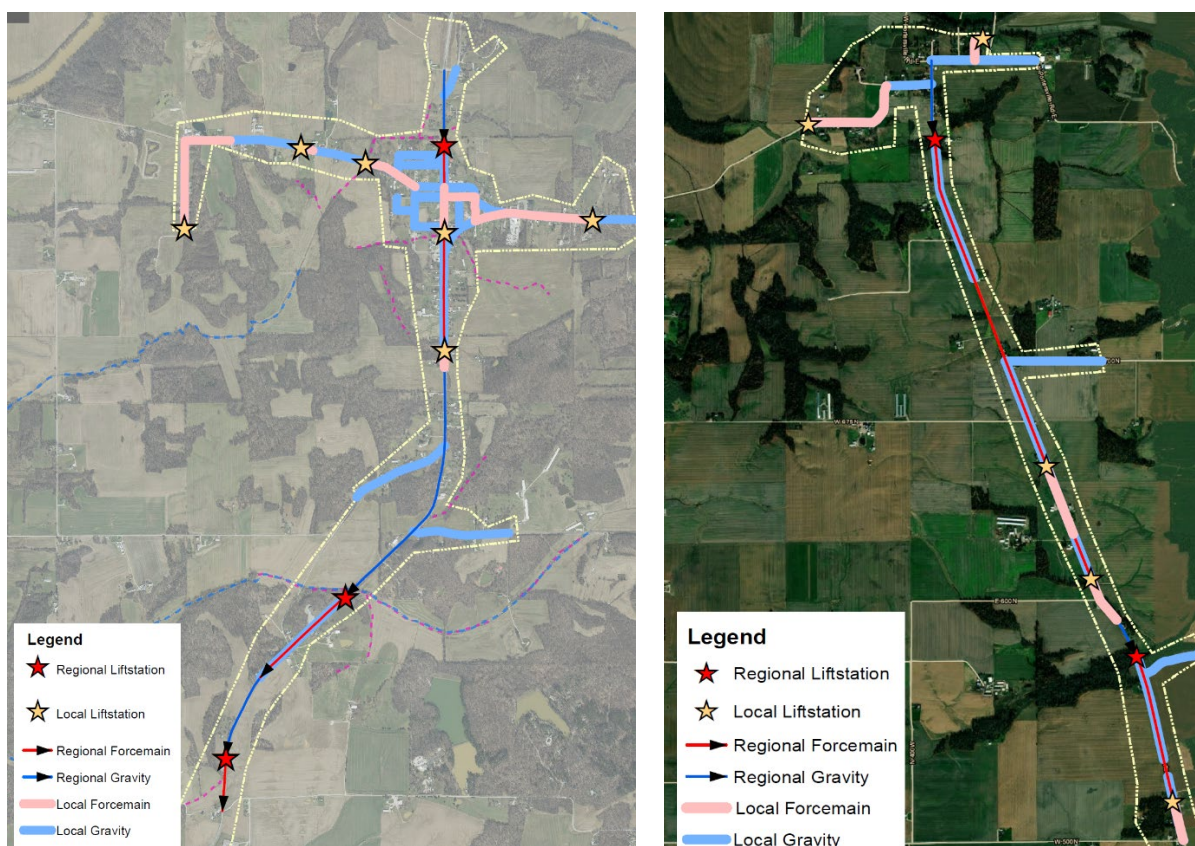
Option 1B - Haysville and Portersville Sewer System
